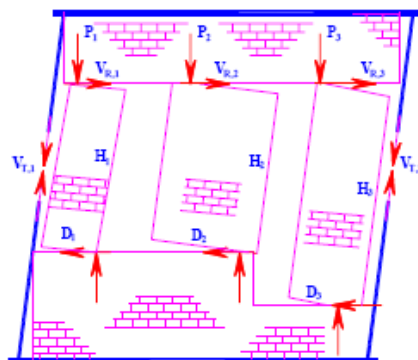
(a) Using vertical and diagonal bracing panel (reproduced after Rai and Goel 1996) (Taghdi 2000)
